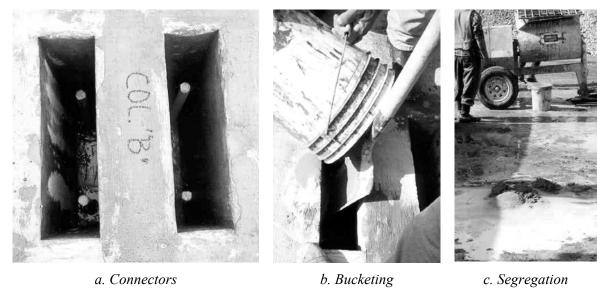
Bucket Grouting of Double-Line Grout Pocket
